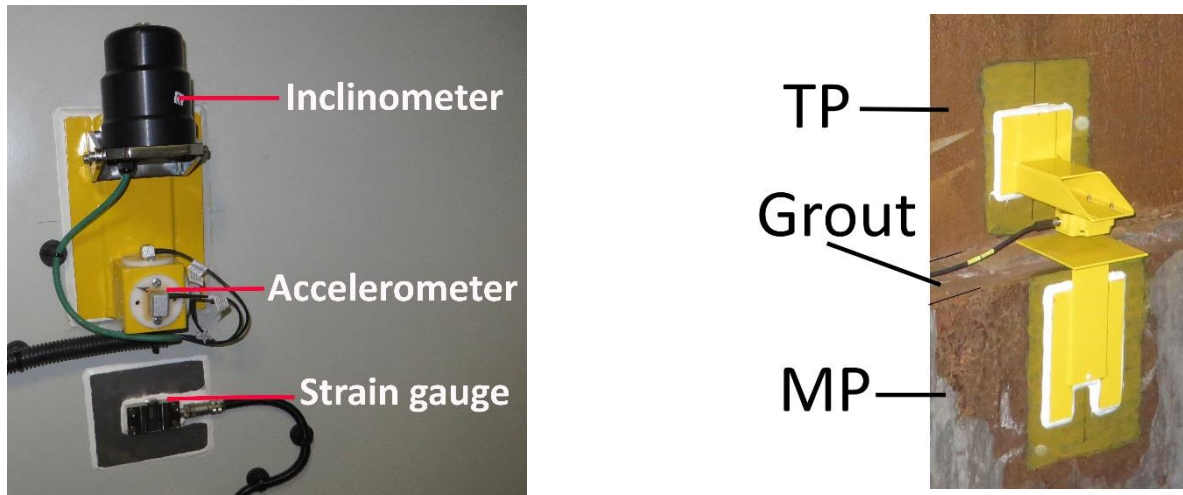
(left) Installed sensors at section 4-4 (270°N) of figure 2, (right) one of the grout sensors installed at section 2-2 of figure 2
